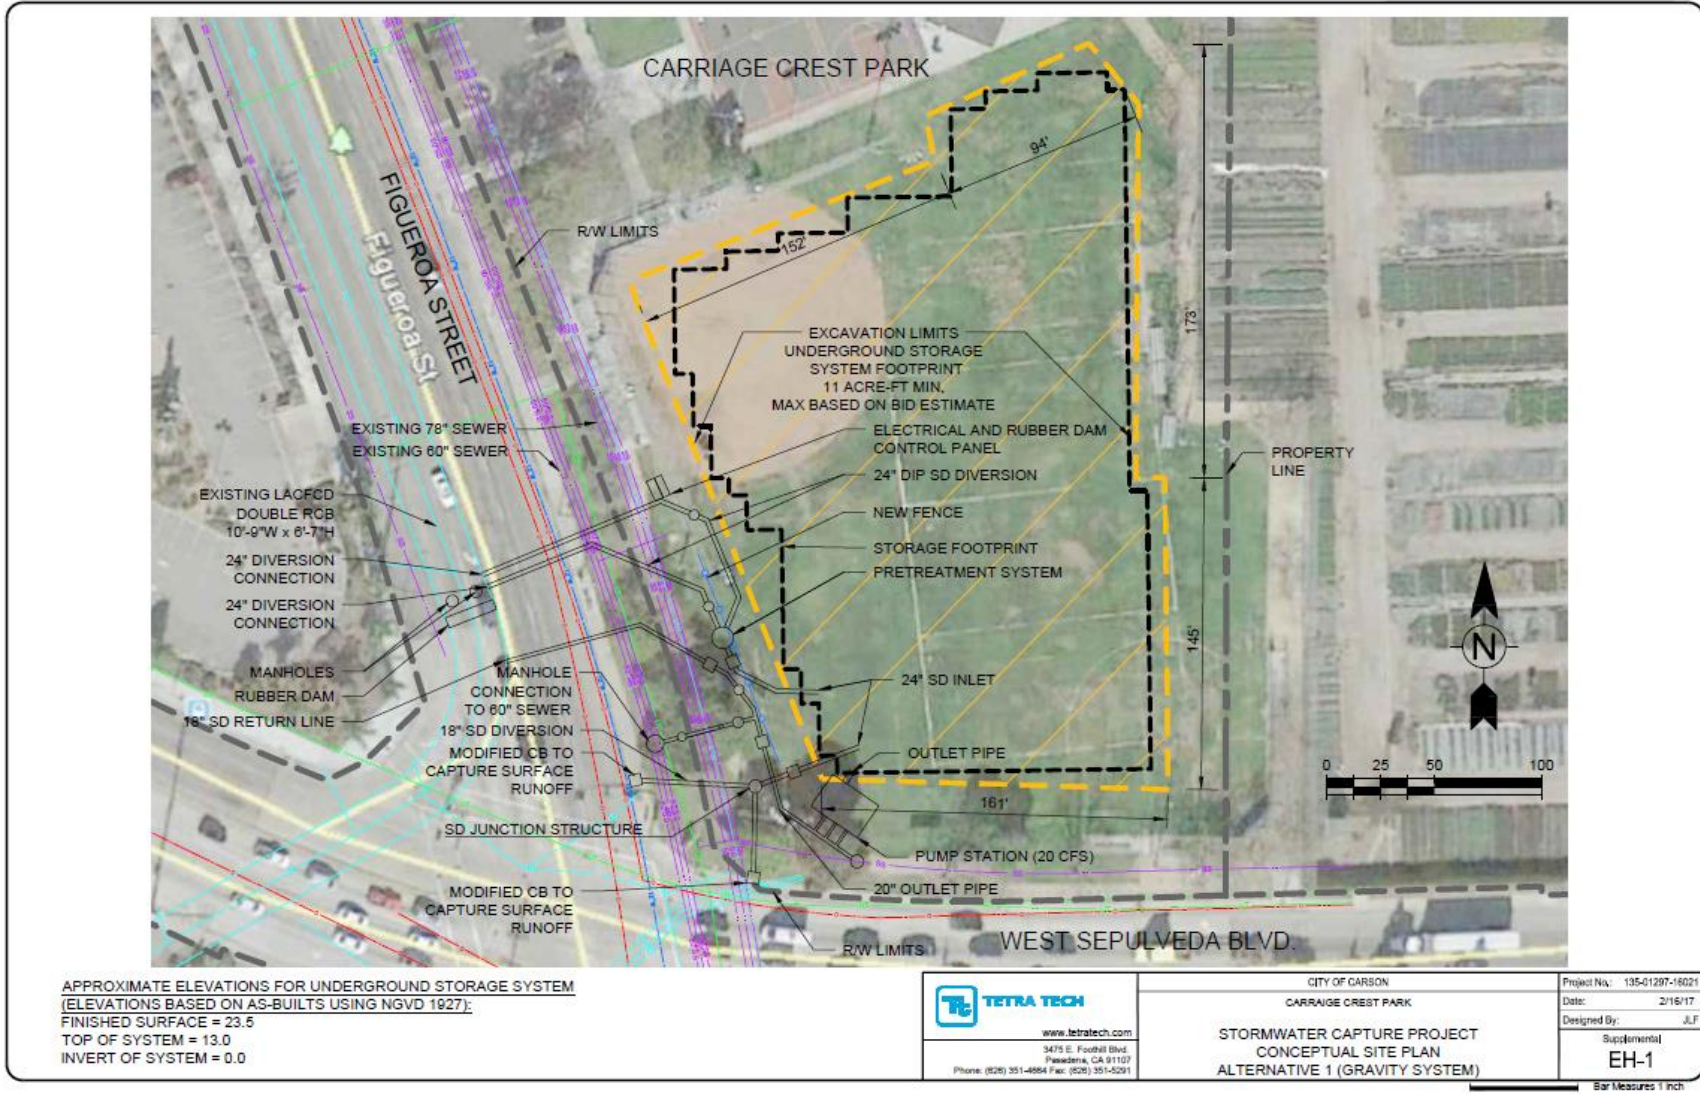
Carriage Crest Park Alternative 1 BMP Layout
